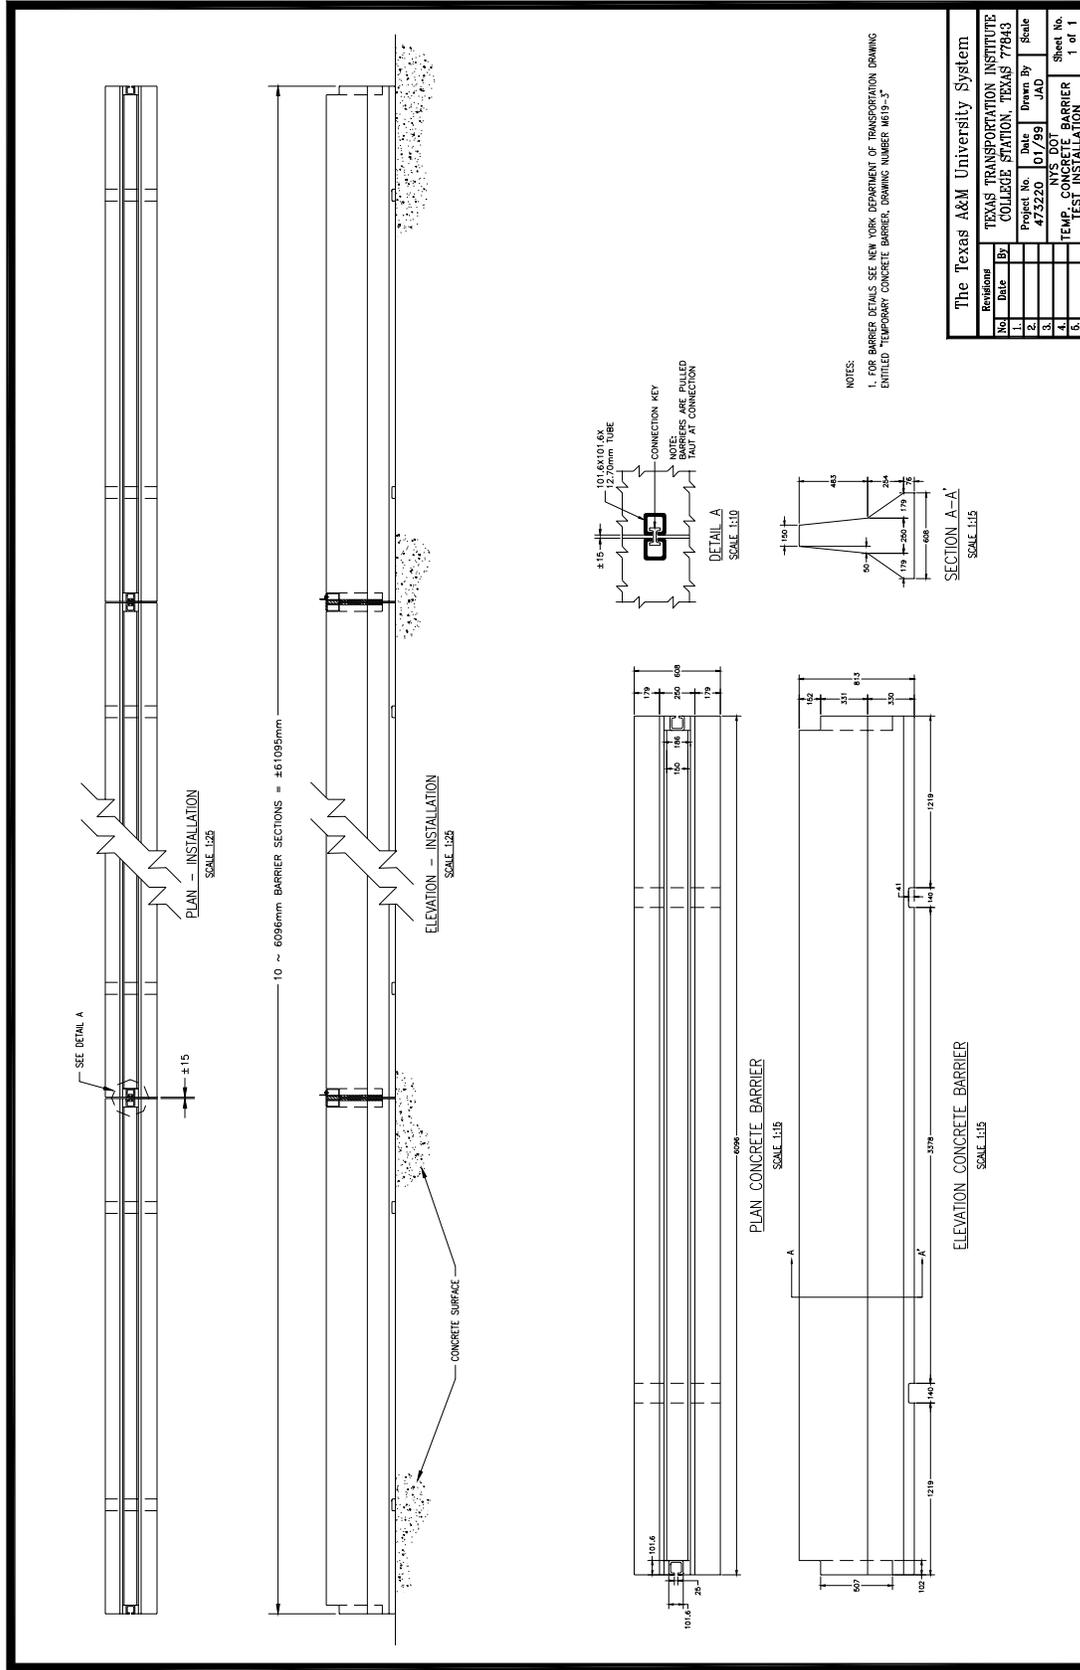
Layout and connection of NYDOT PCB installation prior to testing.
